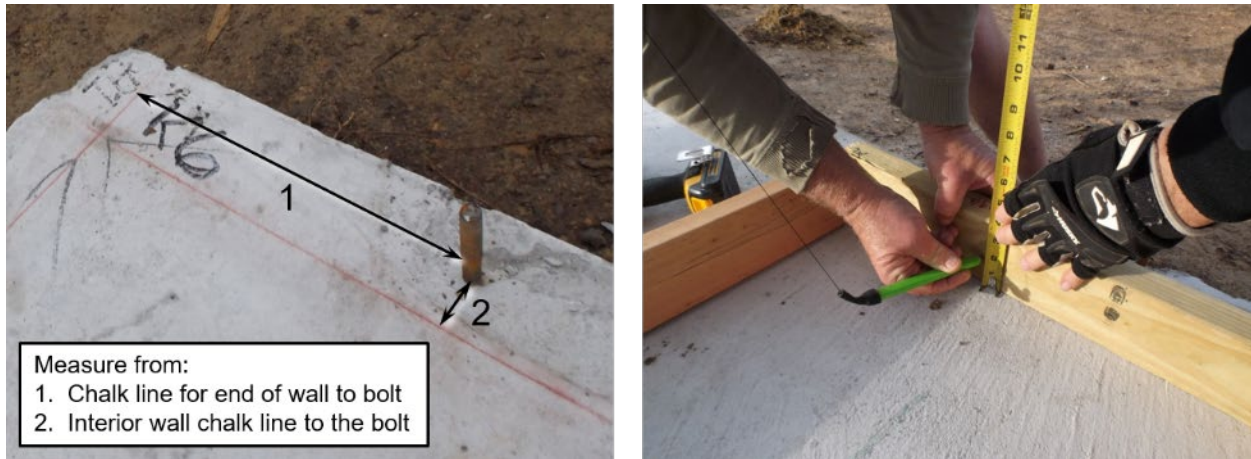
Marking Anchor Bolt Location on Bottom Plate
